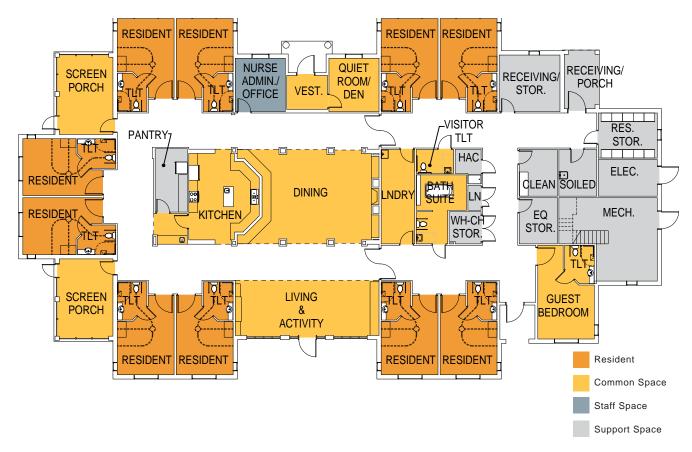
Floor plan of VA Tuscaloosa Community Living Center Cottage (Building 146). The resident rooms are in private areas and are not immediately in front of the dining and living rooms.
